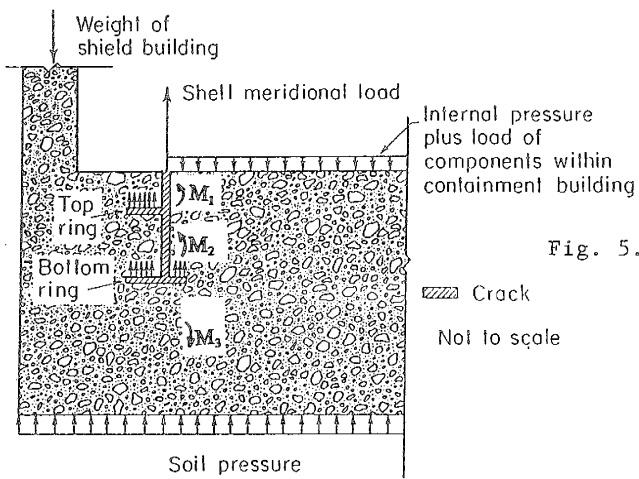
Loads Acting on the Containment Basemat in the Vicinity of the Anchorage System (anchor bolt not shown)
